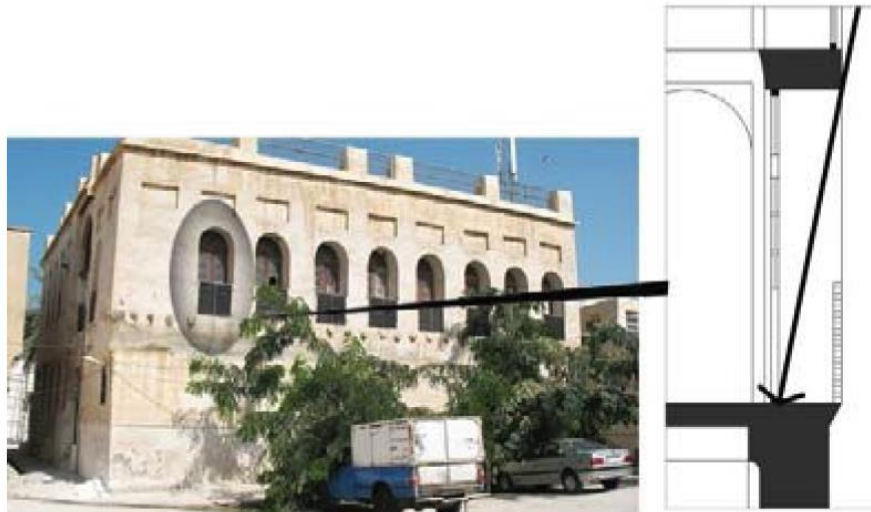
Increased depth of windows facing street to control daylight in Rashidy house (M.Saradj 2014)
